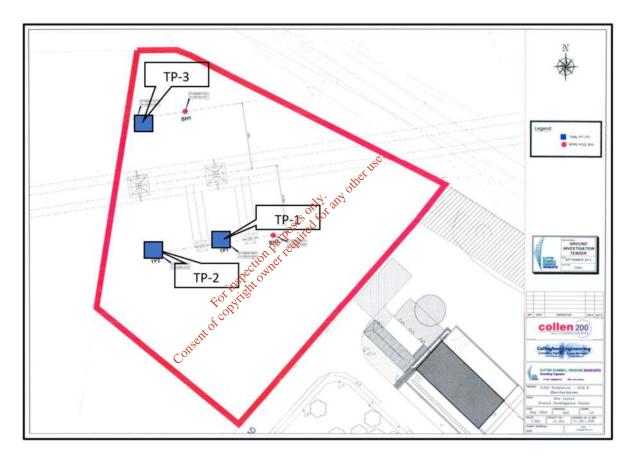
showing No. 3 Trial Pits Completed in 2012 in the Northwest Corner of the Site
